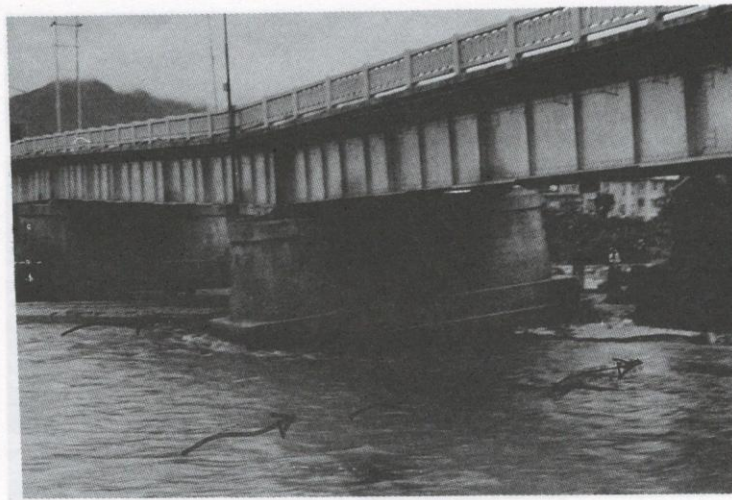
Failure of Pier No. 3, Bagmati Bridge Thapathali on 16 September 1991
